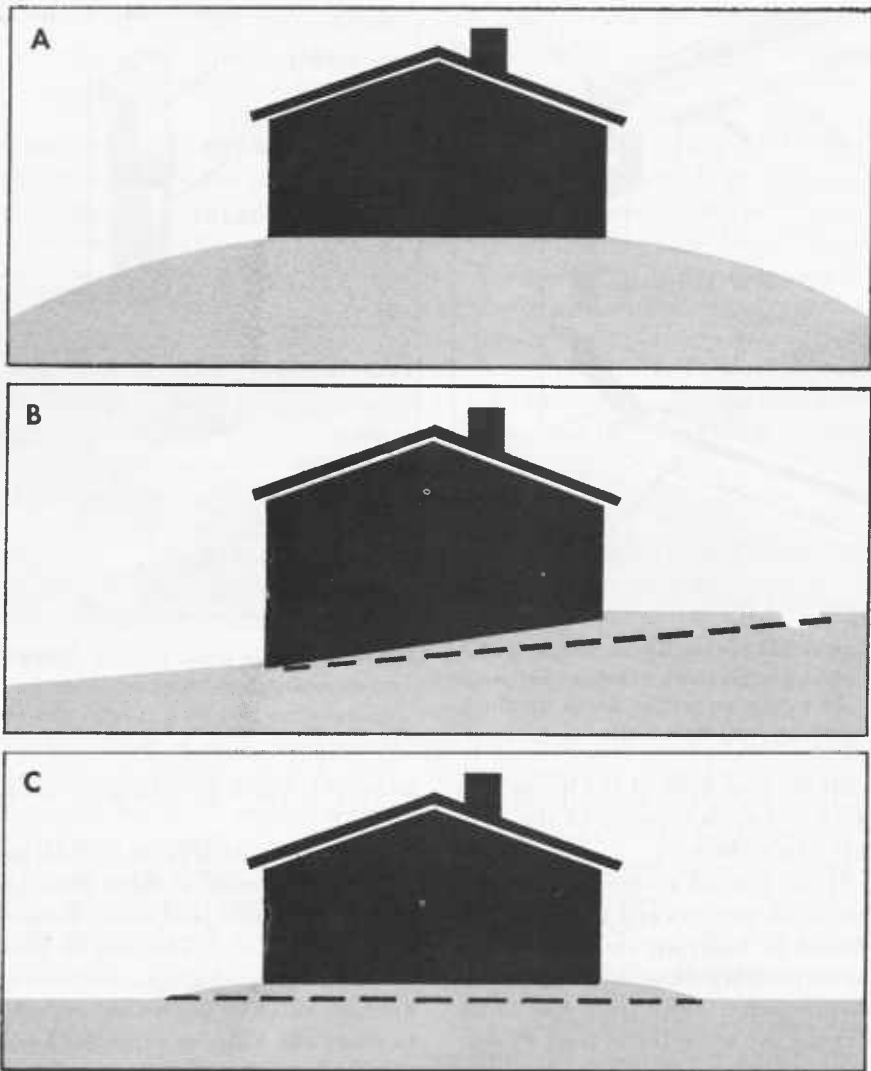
House sites: (A) An elevated site provides good surface drainage away from the house in all directions. (B) Drainage can be routed around a sidehill-located house (note drainage ditch an uphill side). (C) On a flat site, the ground around the house must be built up to drain water away from the basement walls.
